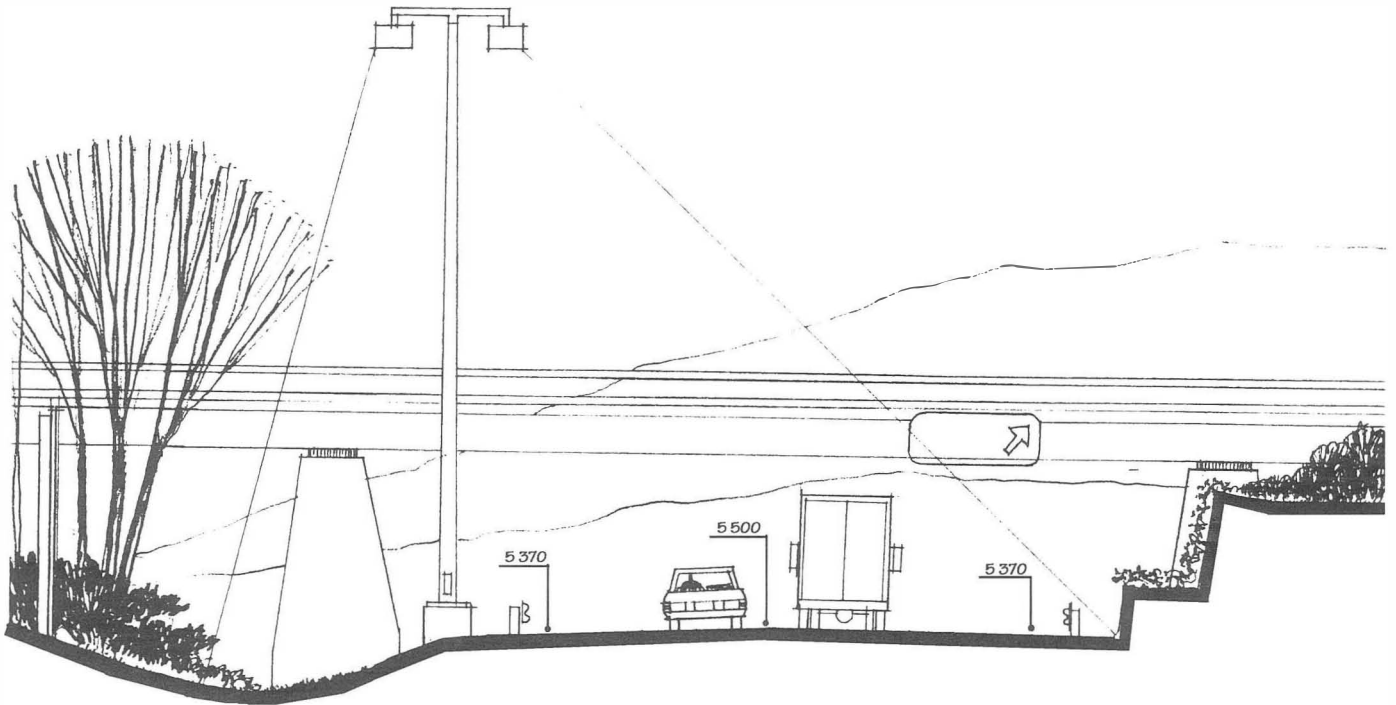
a. A typical design cross section emphasizing finished surface elevations.
